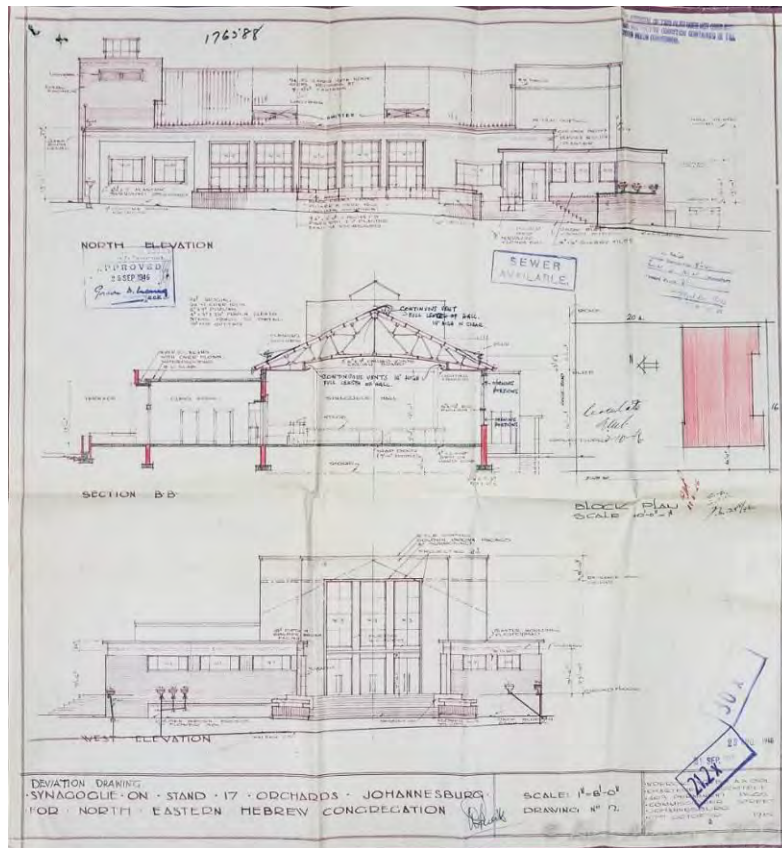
Plan for proposed Synagogue on Stand 17 used as Synagogue hall Single storey religious building with main entrance from Pine Street (Source: City Council of Johannesburg, Plans Archive)
